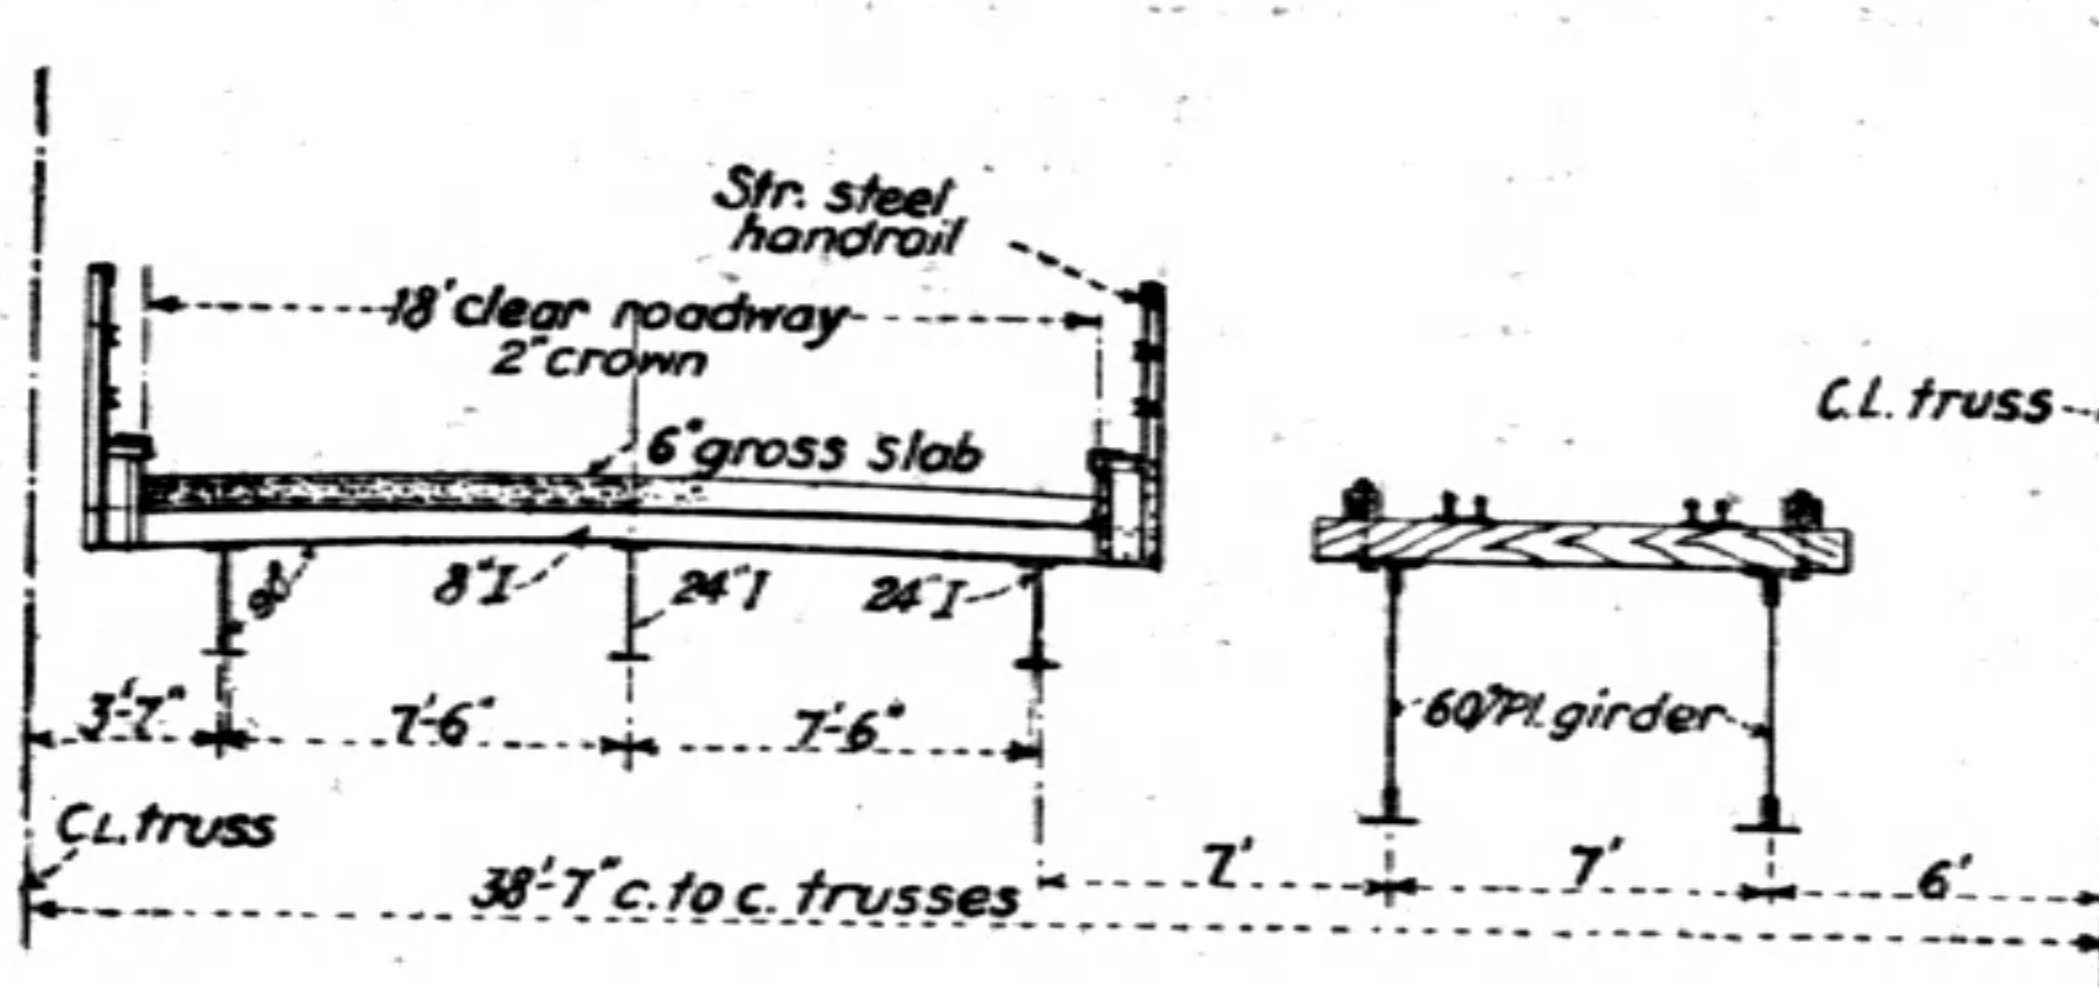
CROSS-SECTION OF RAILROAD AND HIGHWAY DECKS
